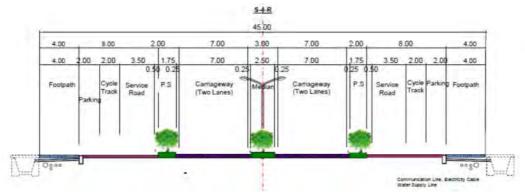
Proposed Typical Cross Section (Secondary-4 Lanes)
